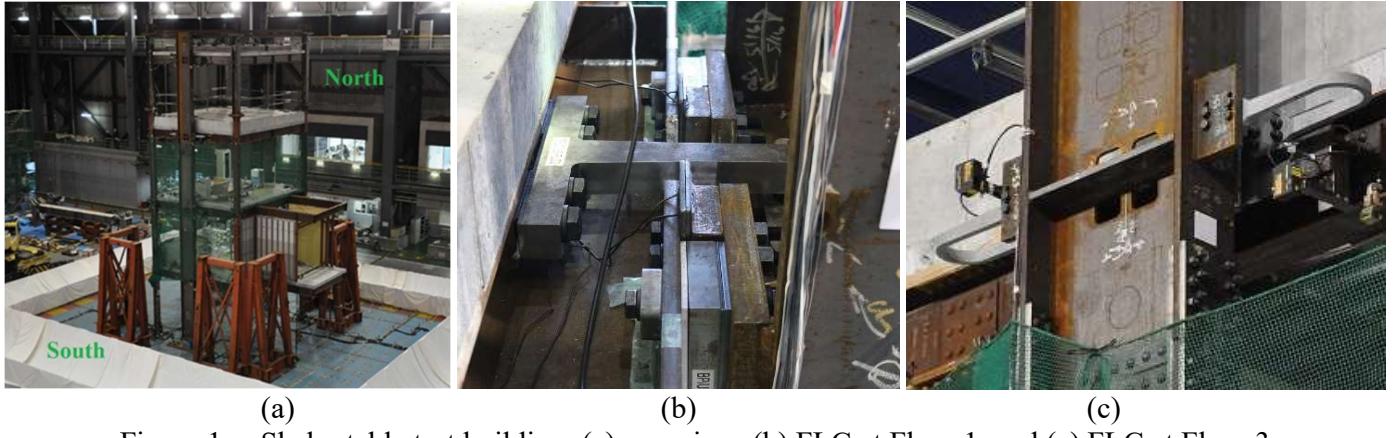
Shake-table test building: (a) overview, (b) FLC at Floor 1, and (c) FLC at Floor 3
